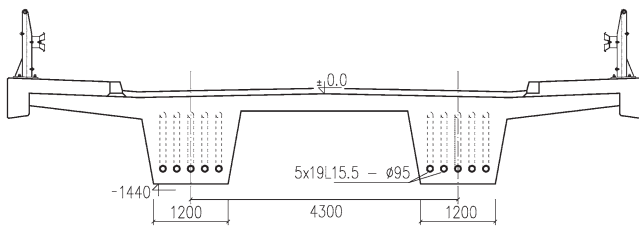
Cross section of typical double-beam, post-tensioned, highway bridge.
